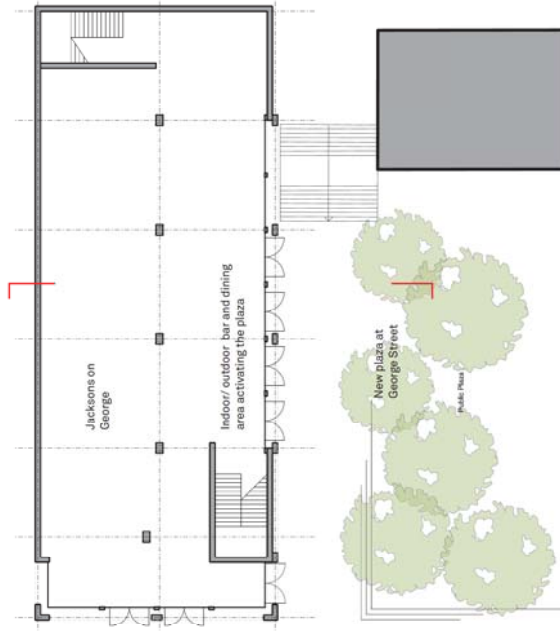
Indicative ground level plan of Jacksons on George illustrating the potential to open the building to the south creating a new active facade.
